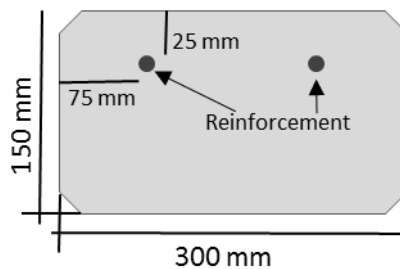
Illustration of top and bottom side on concrete beams (see also Figure 7). Measures in mm. Top side up.
